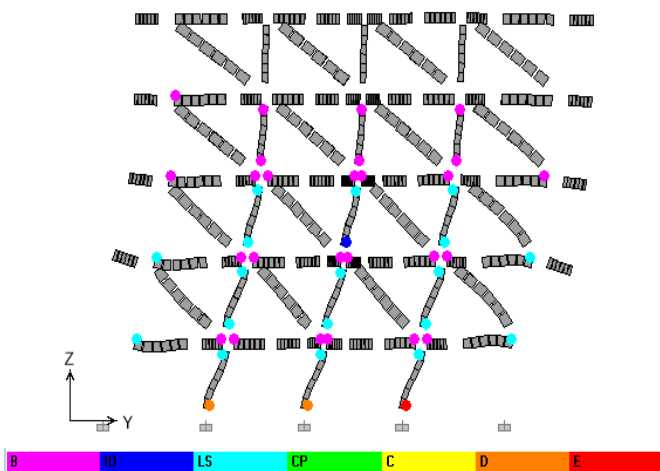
Elevation view-G Deformed shape (PUSHY) before retrofitting
